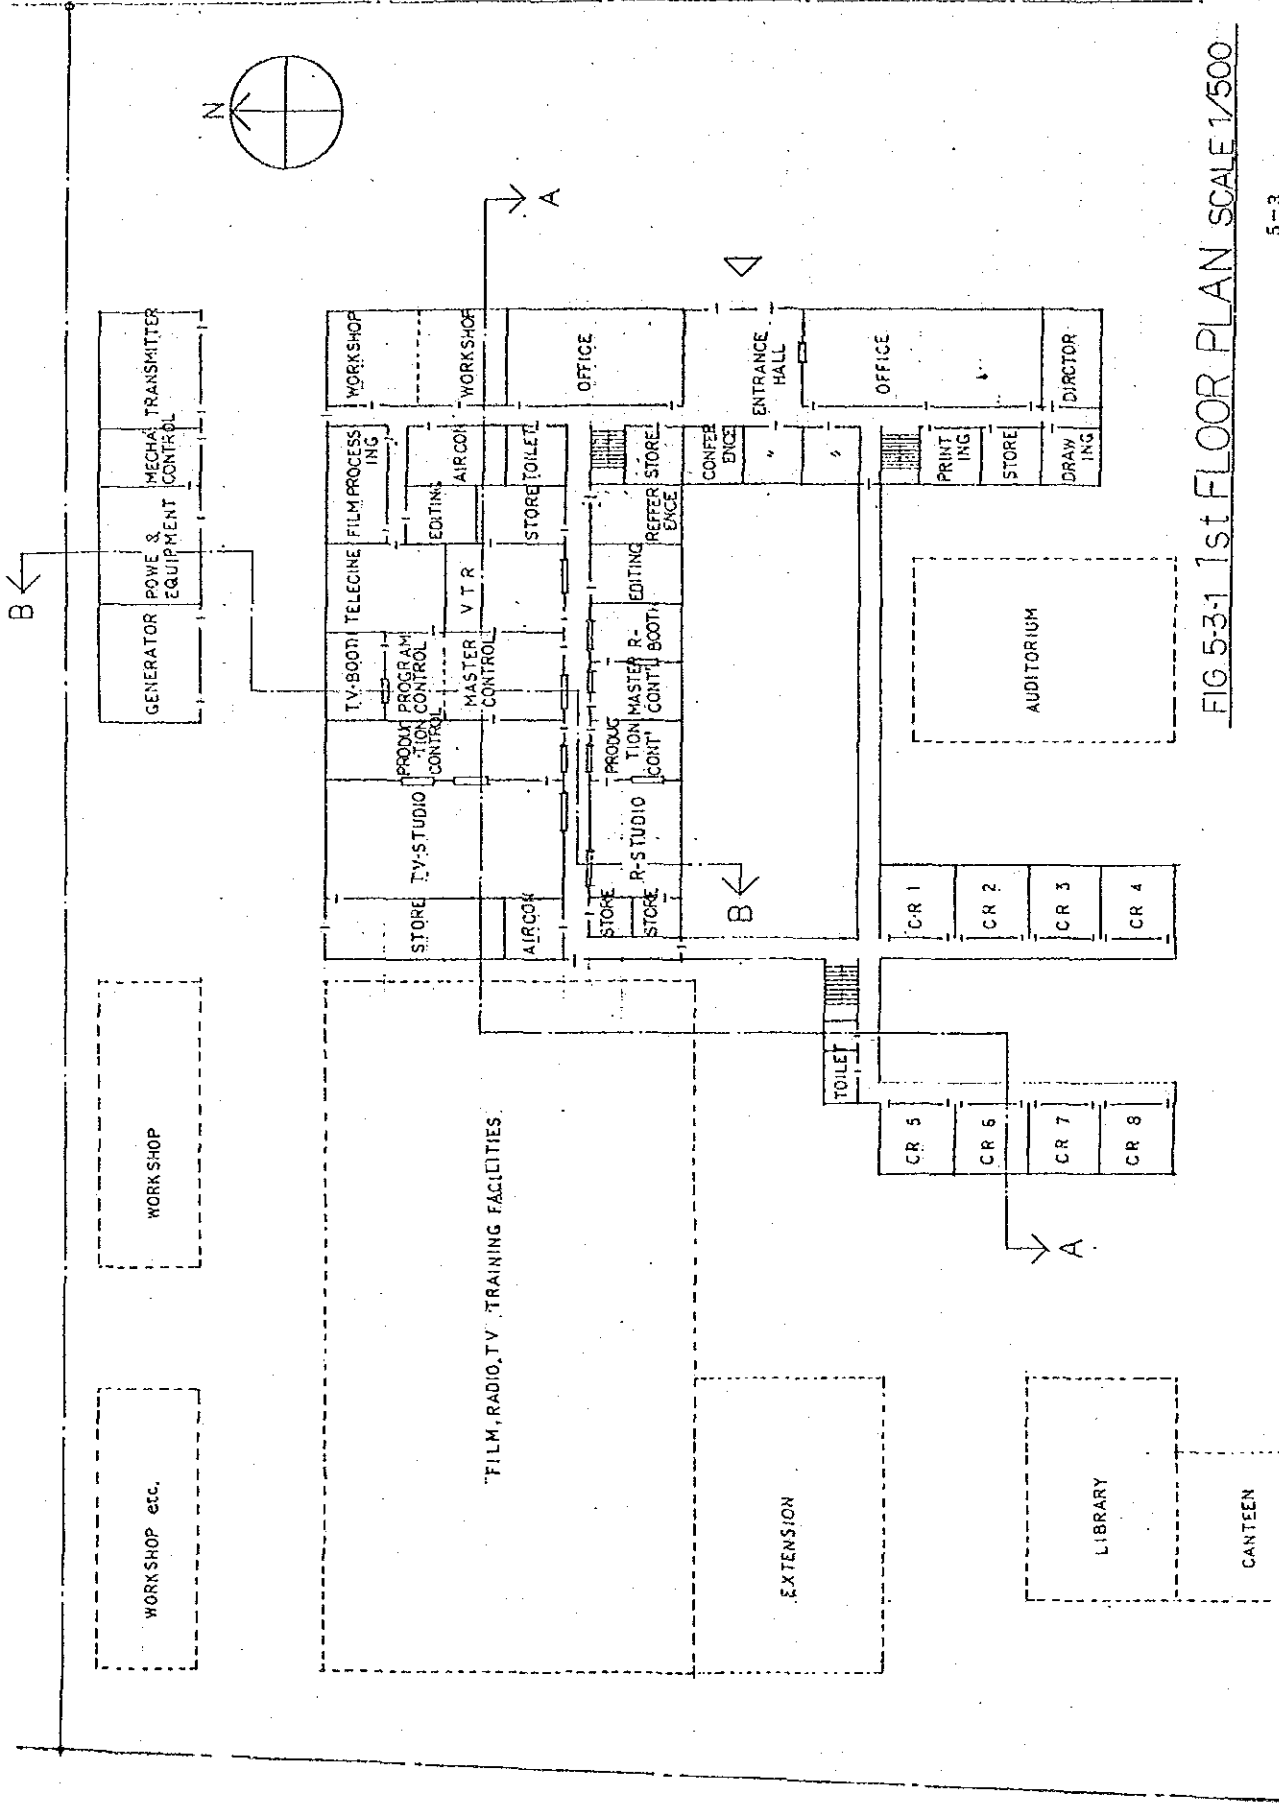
1st FLOOR PLAN SCALE 1/500
